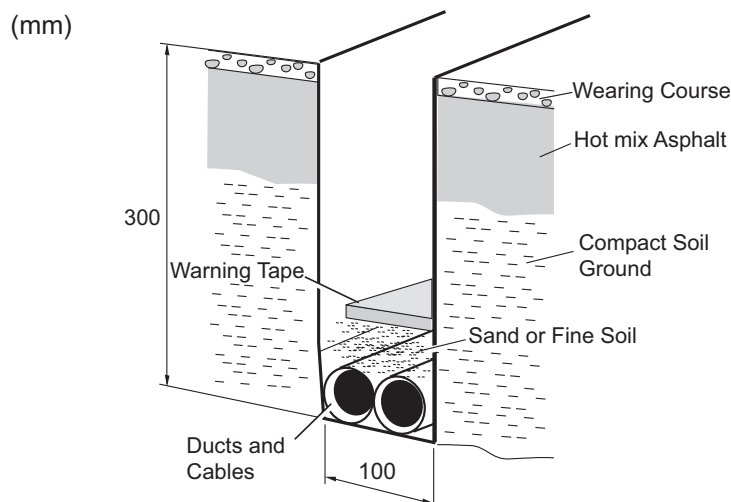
Typical Trench Dimensions in Mini-trenching.
